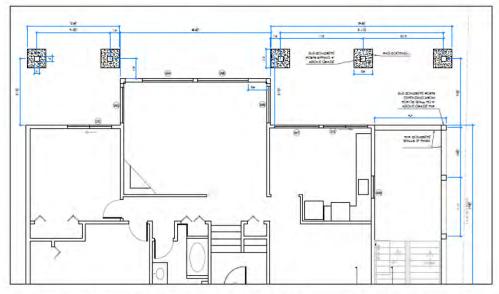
Arial view of the proposed locations of concrete footings (north) and concrete wall (east) for the foundation. Drawings provided by Momentum Design Build.
